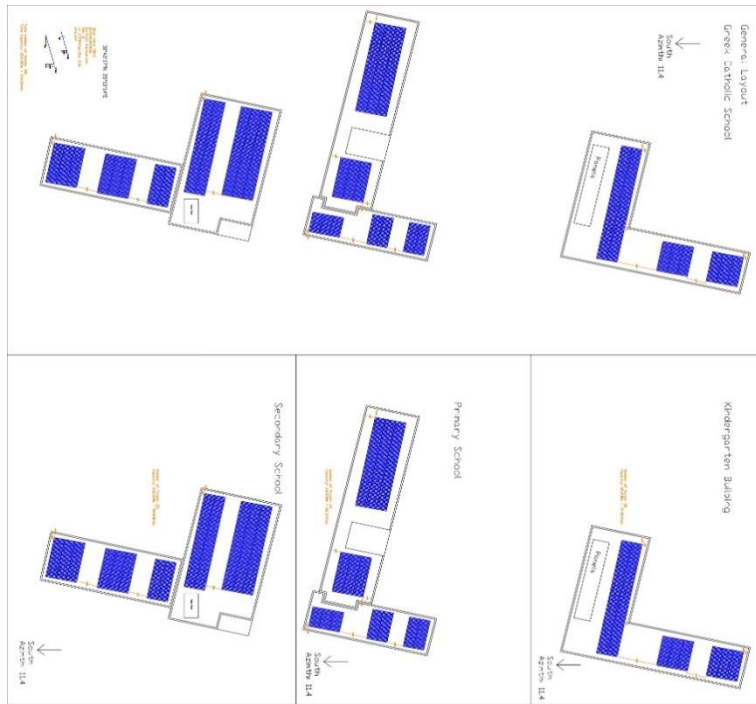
Distribution of photovoltaic panels on the roof of the Greek Catholic Patriarchate school buildings (secondary building, primary building, and kindergarten building)
